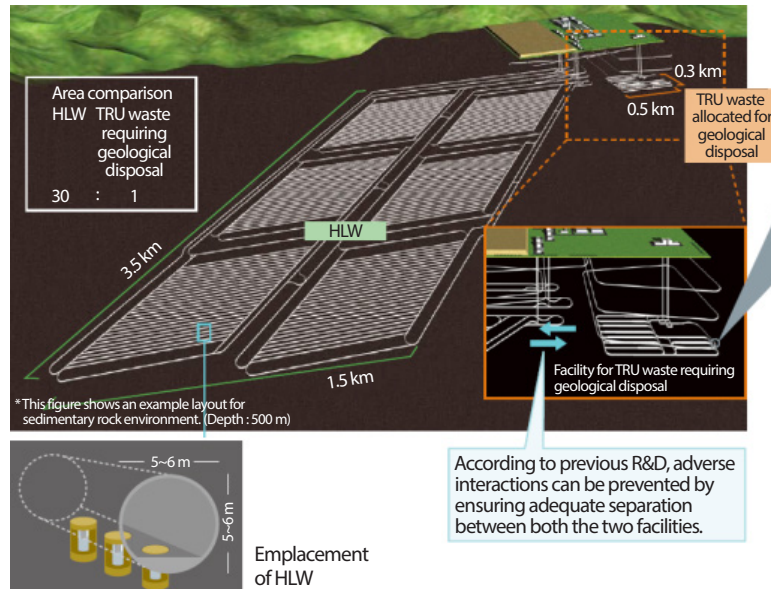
Schematic layout of HLW disposal facility in Japan [21].
